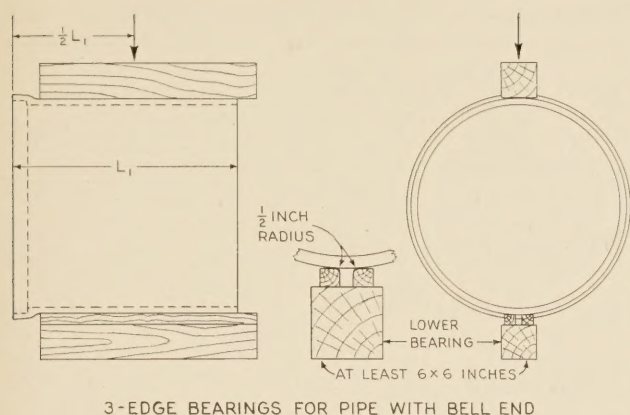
POSITION OF BEARINGS IN CAST-IRON PIPE TESTS.
